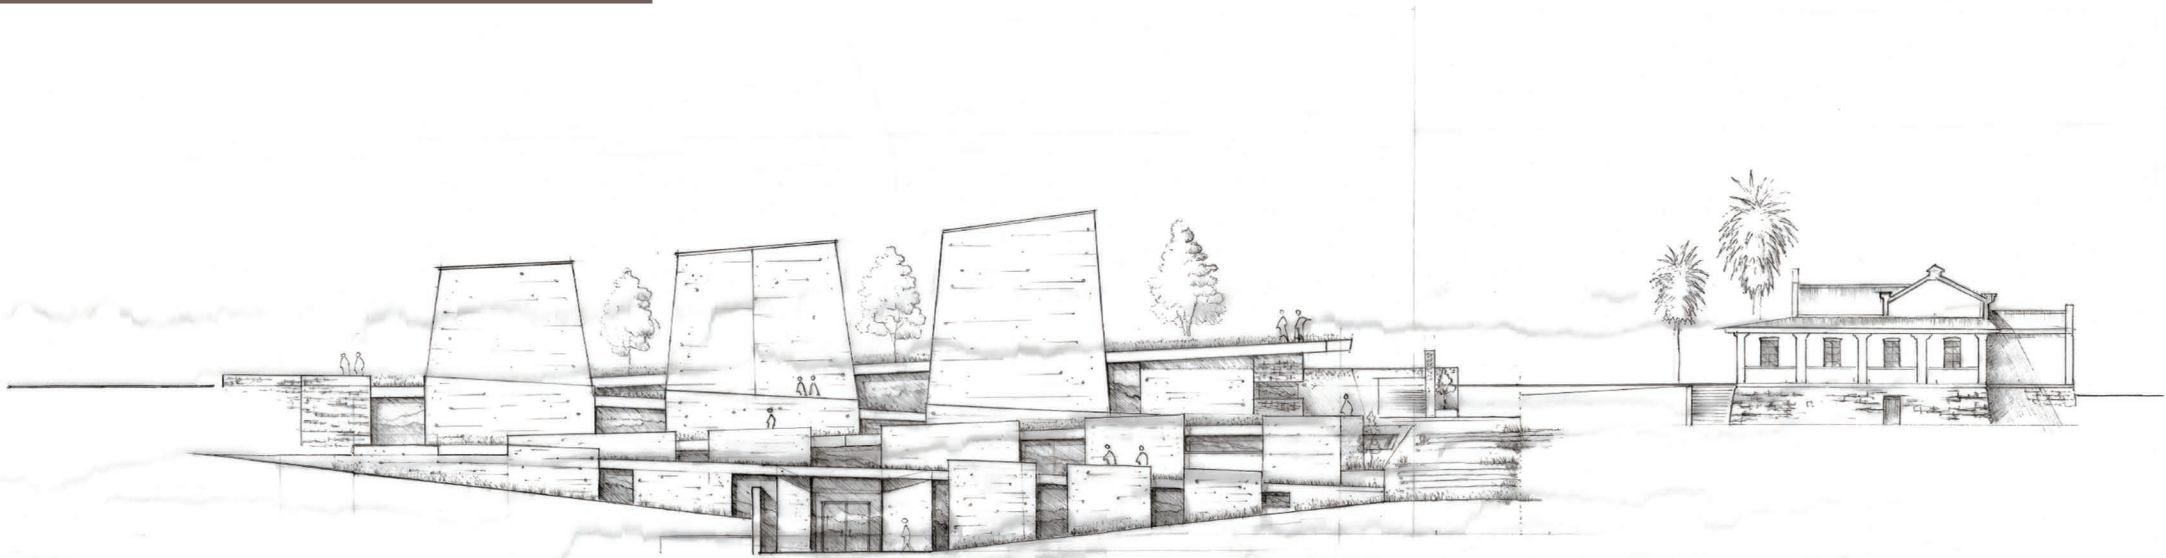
West elevation showing the monolithic language of the facade as well as the roof-scape as one traverse up the site.
